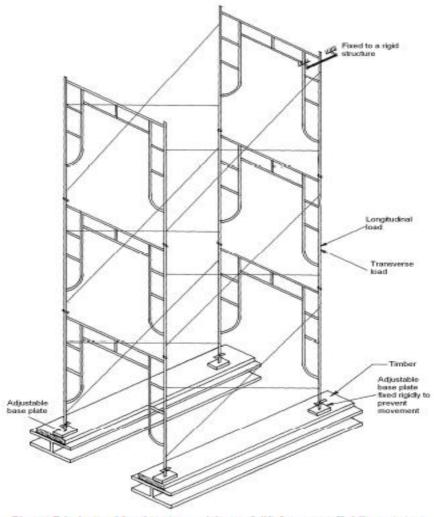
Lateral load test on a 1-bay x 3-lift frame scaffolding system
